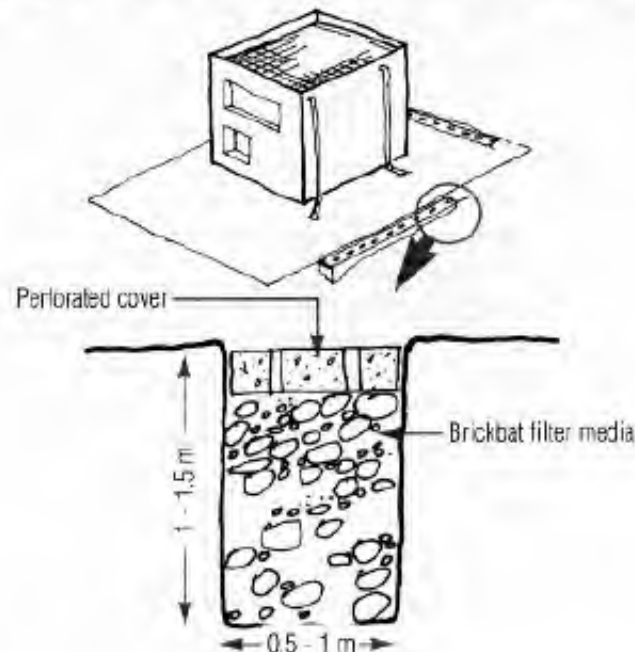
Recharge pit constructed along periphery of building and detailed section of recharge pit
